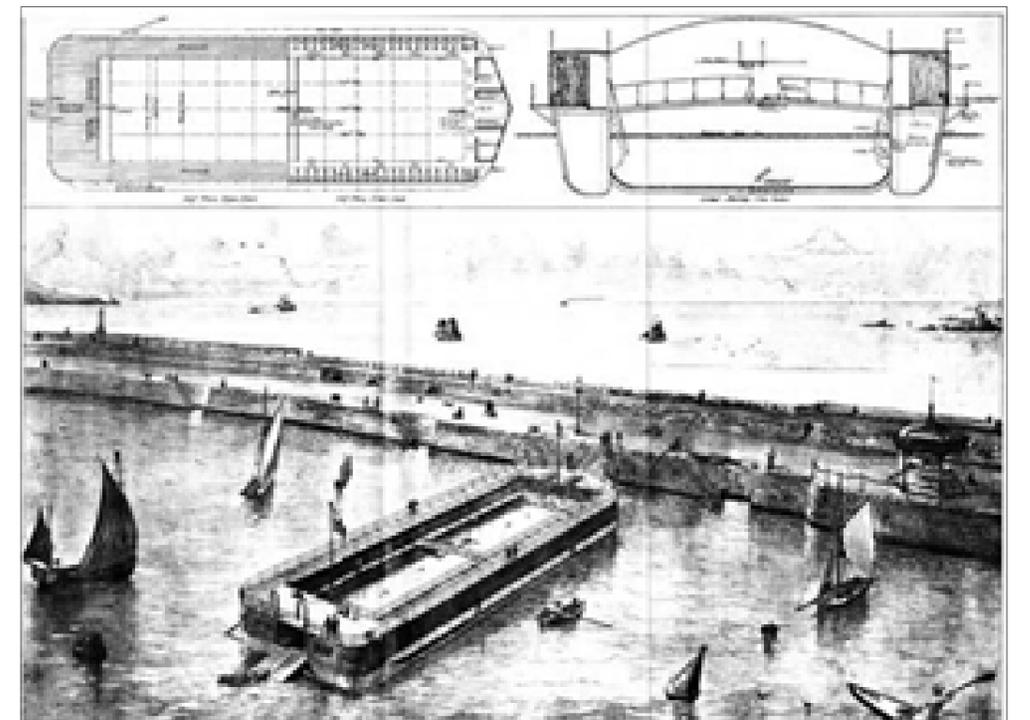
(right): Historic unbuilt proposal for outdoor baths off the East Pier, to be located north of the bandstand.
